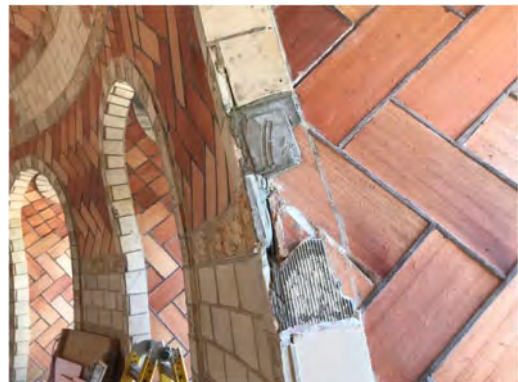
A finish tile removed at the soffit layer of St. Paul's Chapel inner dome reveals gypsum-lime mortar at the soffit tile joints. Photograph by Derek Trelstad.
